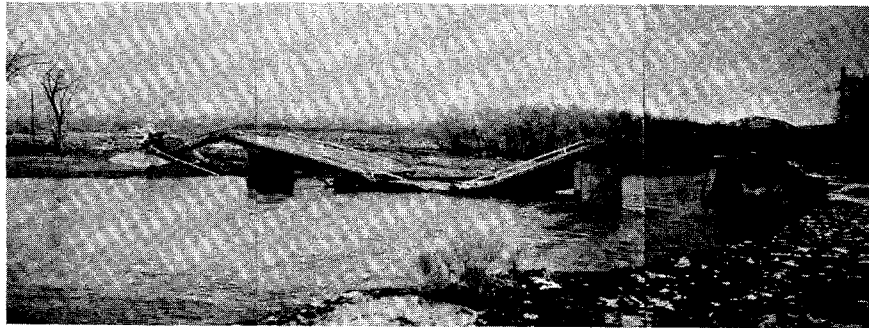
View of collapsed bridge, scoured piers and eroded abutments following flood of December 24, 1955. (From Nevada Dept. of Highways.)
